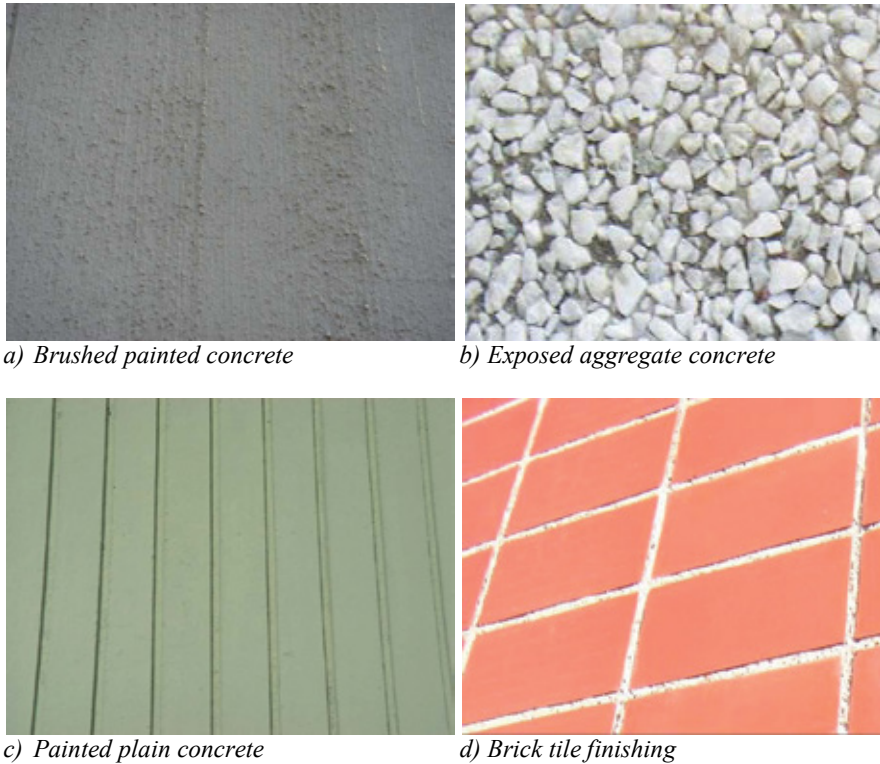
The most typical surface types in Finnish concrete facade panels.
